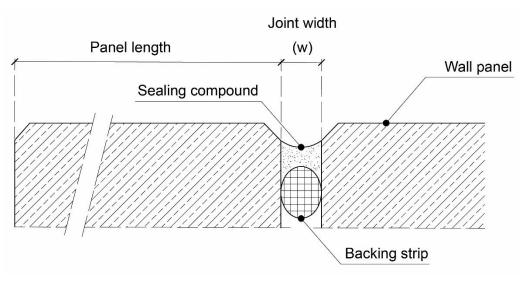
Detail of a typical external wall joint. Adapted from (Bachmann et al., 2009, p.232)
